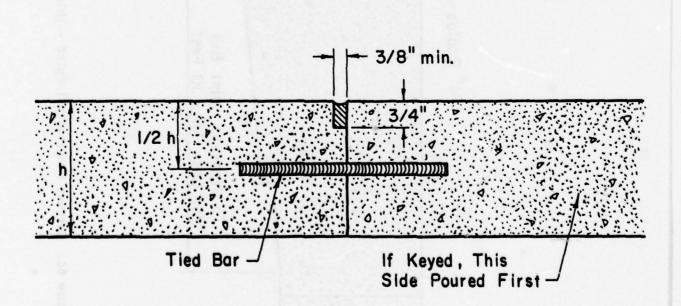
Currently Used Longitudinal Joint - Tied Butt or Tied Keyed Joint.
